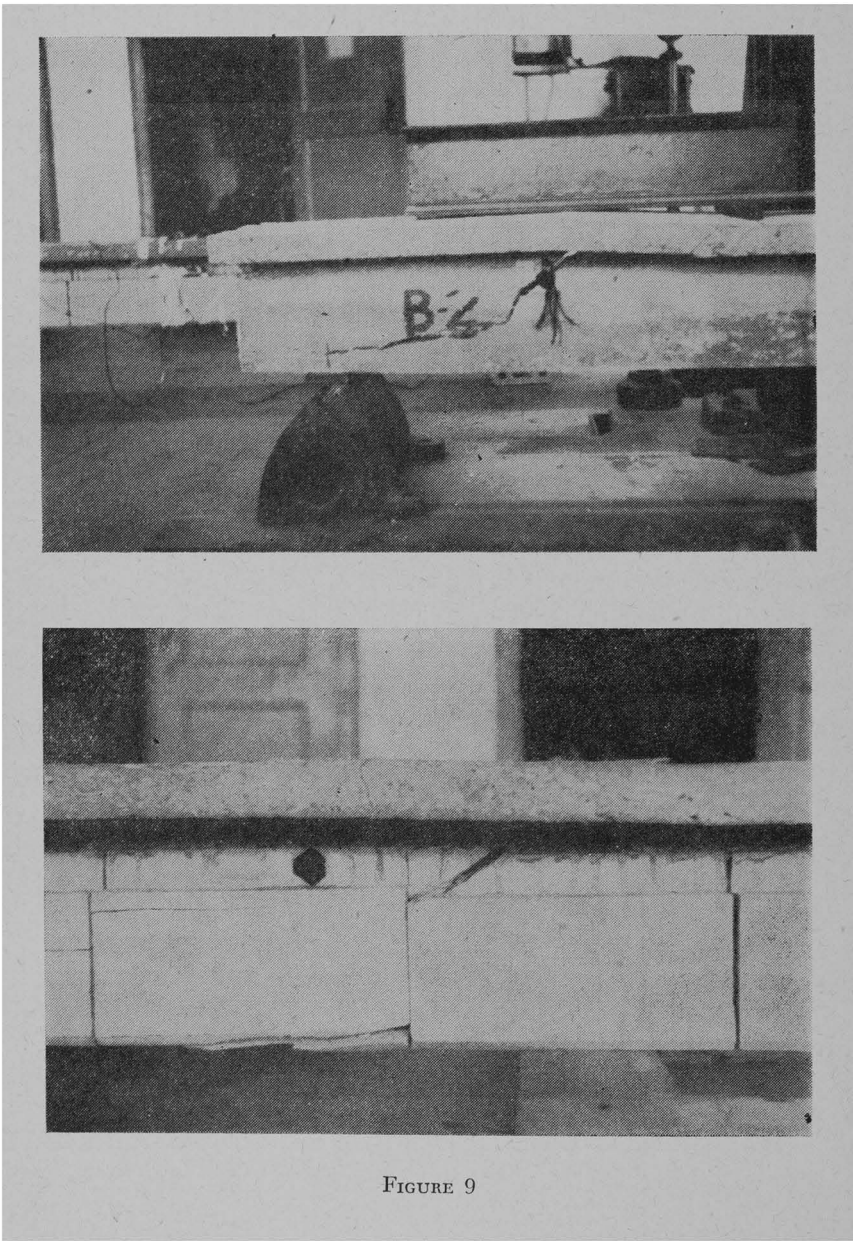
shows a typical diagonal tension failure for a concrete beam and for a tile-concrete beam. Figure 10 shows the appearance of the tile before the outside shell is removed and after the outside shell is removed. All tile-concrete beams that failed in diagonal tension developed similar rupture planes.
